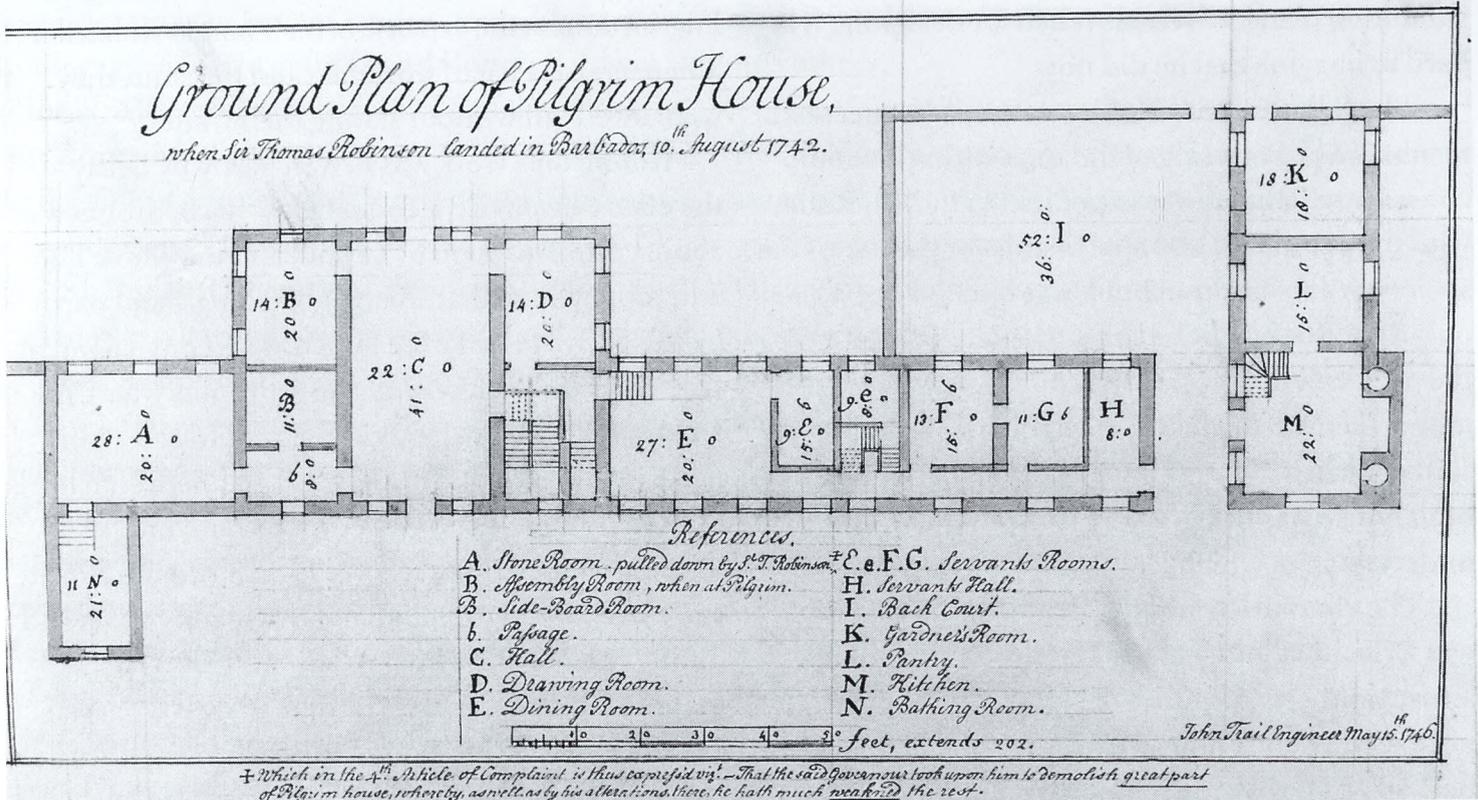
John Trail, plan of the Governor's house at Pilgrim, Barbados, in 1742.
